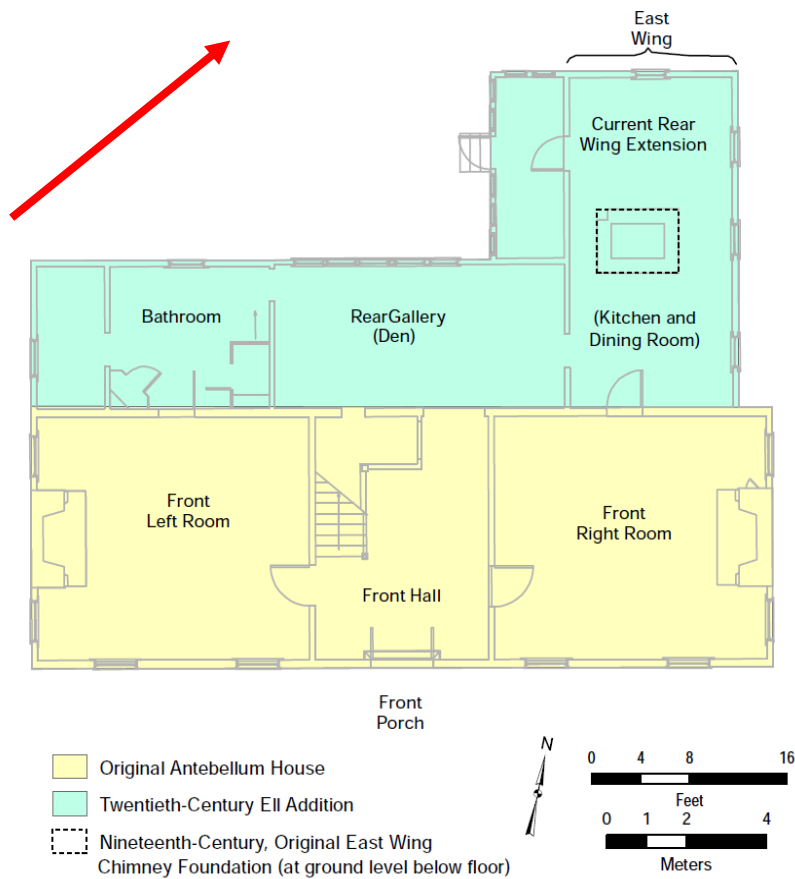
PAI's depiction of the Levi Jordan house plan
